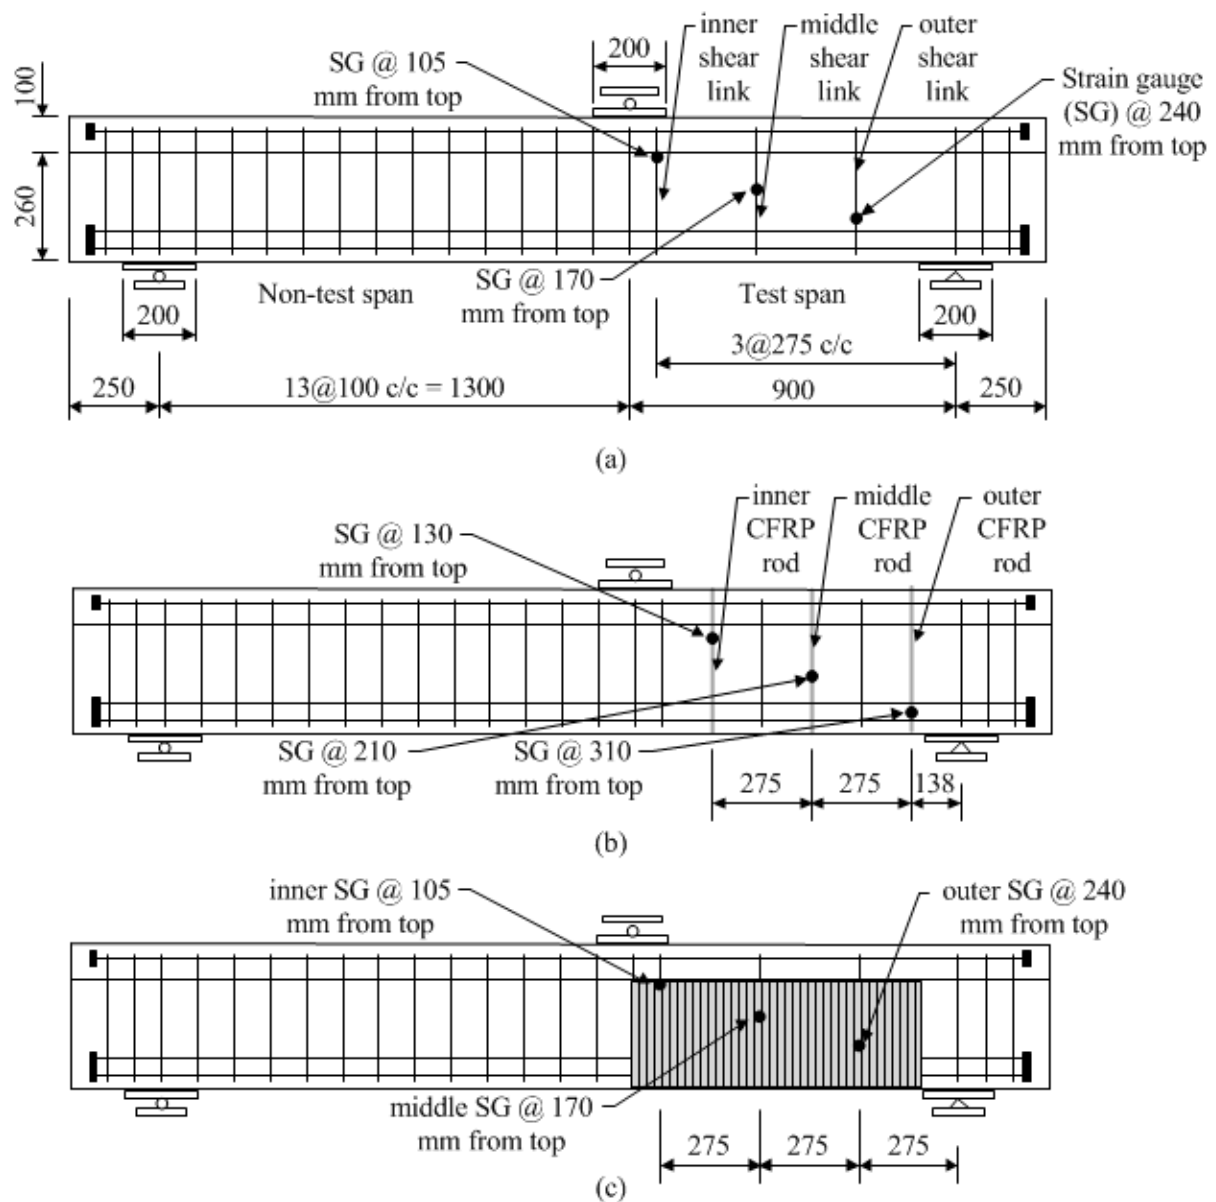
Test setup: (a) unstrengthened beams, (b) DE CFRP strengthened beams, and (c) EB CFRP strengthened beams – all dimensions in mm
